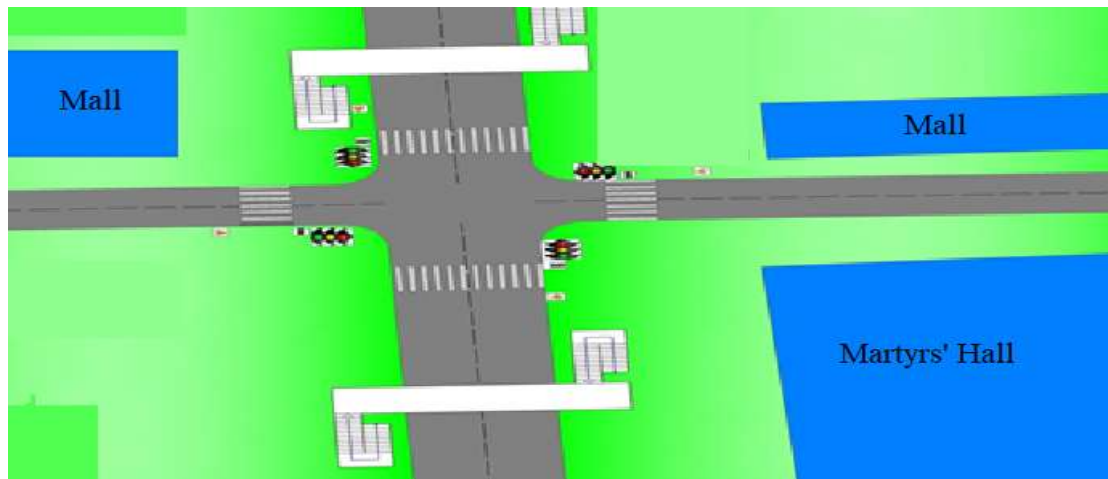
Shows the design proposal 2 for the intersection, Martyrs' Hall
